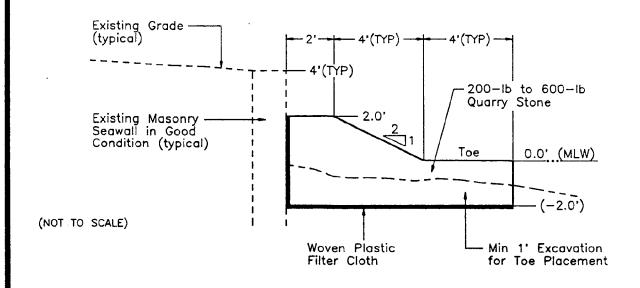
Typical Sections of Stone Revetment and Stone Reinforcement
